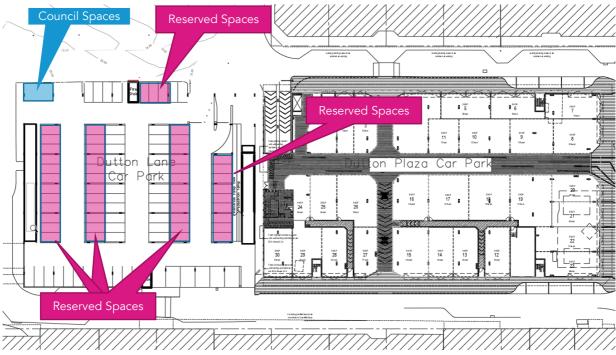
Existing Dutton Lane Car Park- Space Allocation (Ground Floor)
